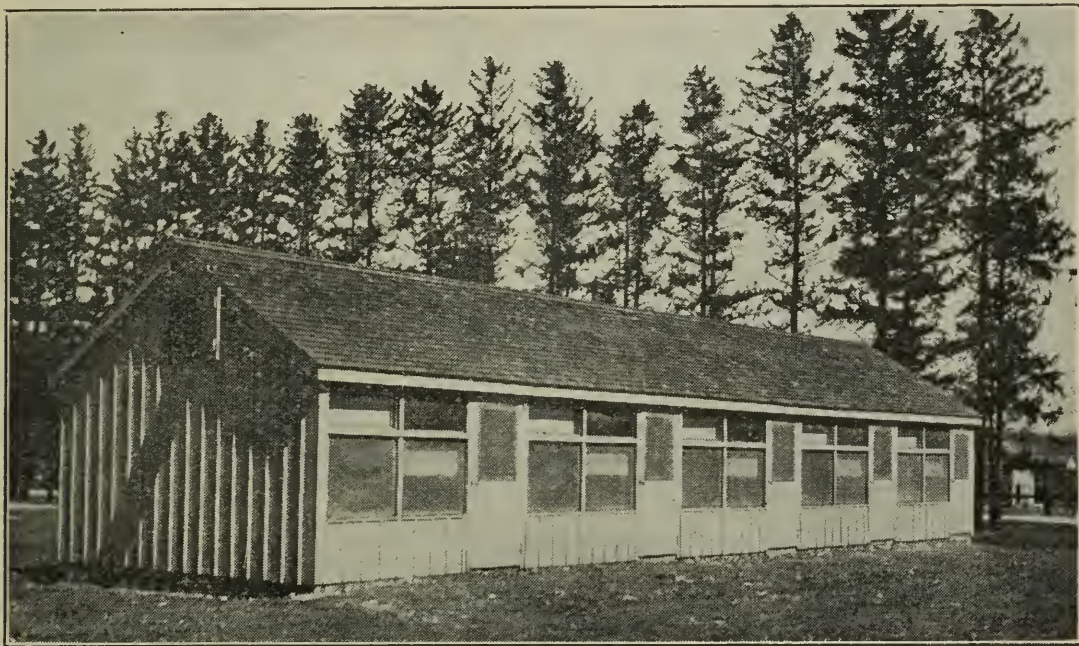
Poultry Breeding House 12'x60' with glass substitute windows and cotton ceiling loft.
